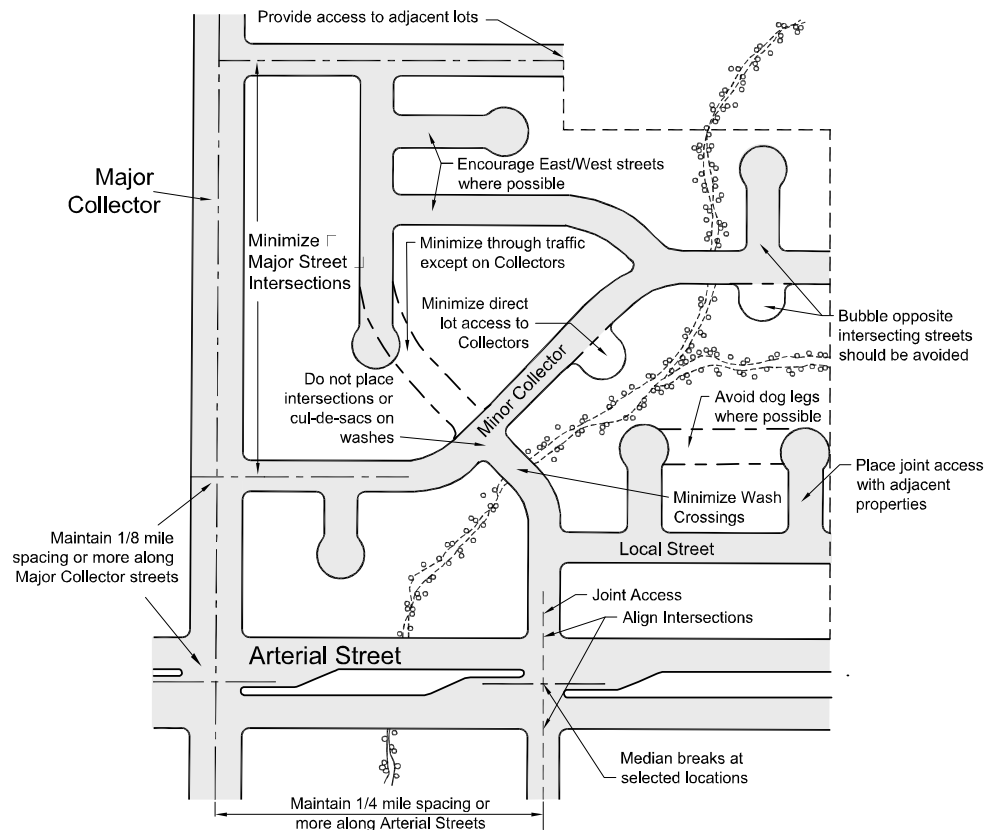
SUBDIVISION STREET PLANNING
